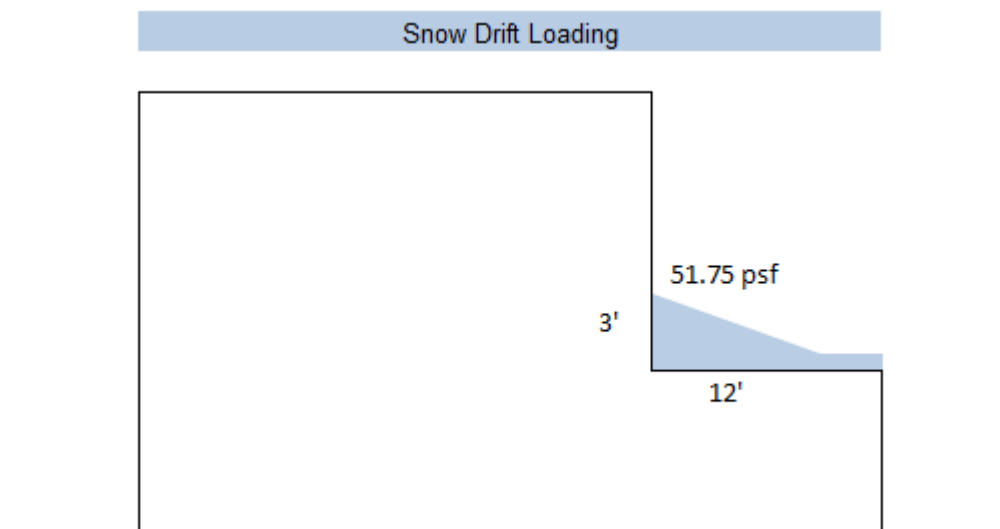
SNOW DRAFT LOAD ON ATRIUM ROOF
